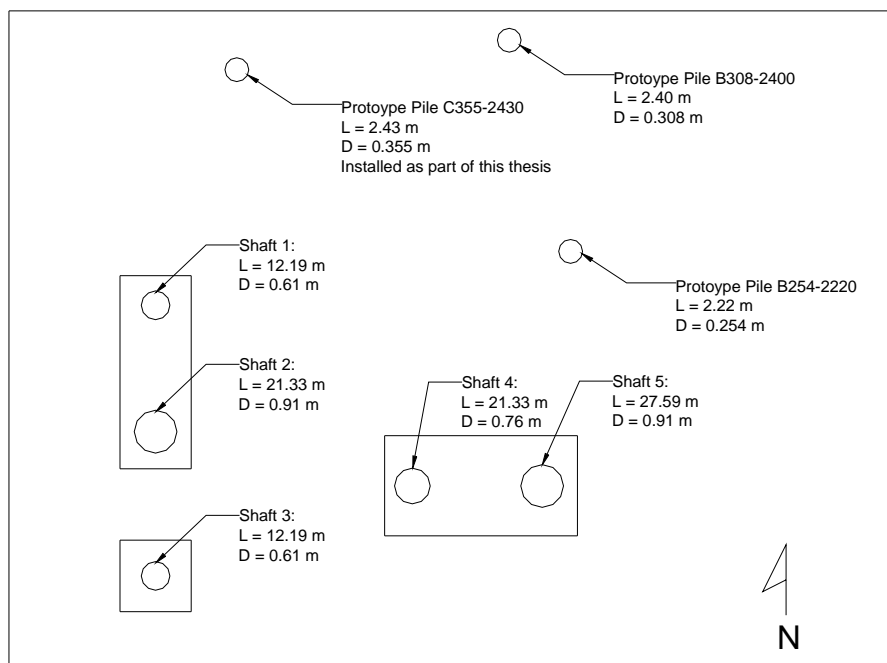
Locations of drilled pier caps and prototype piles at NGES Northwestern University
